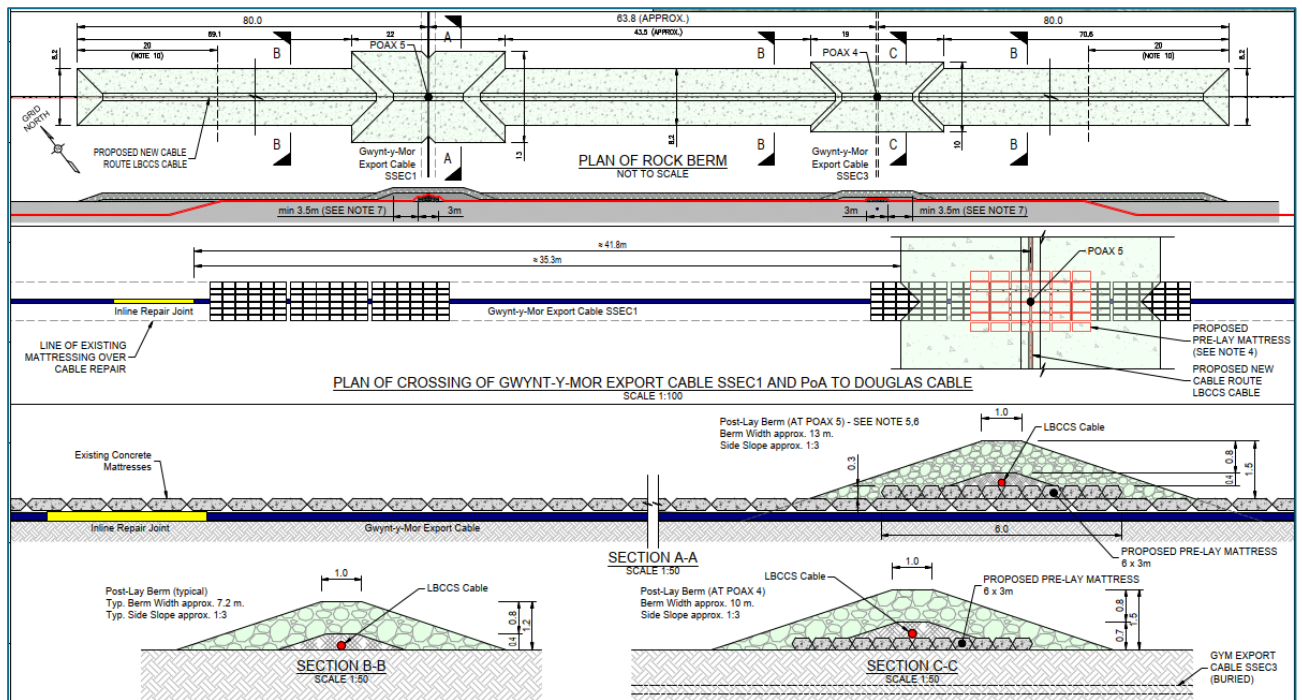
Plan view, and elevation of PoAX-4 and PoAX-5 crossings with mattress and rock protection
